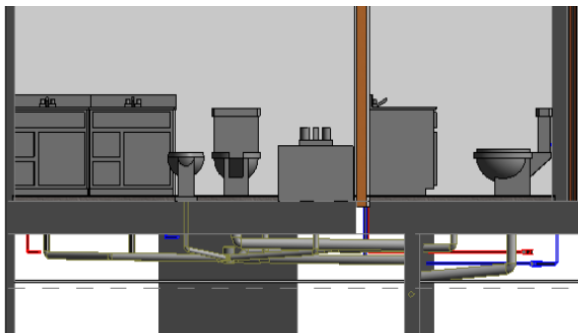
Clash detection for plumbing performed within a suspended ceiling.
